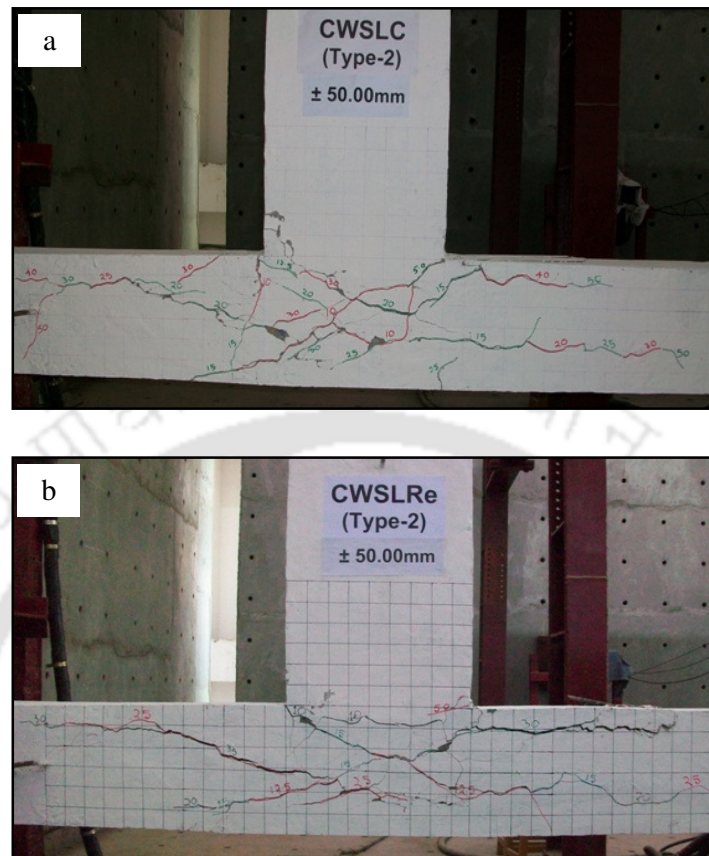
CWSL specimens at the end of test under loading type-2:
